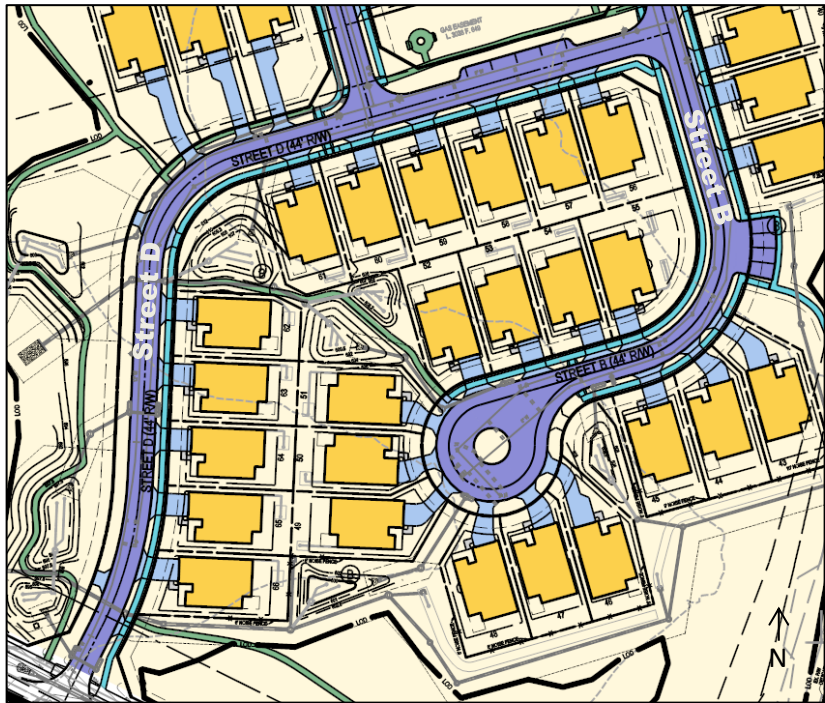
Cul-de-sac bulb at Street B and sidewalks shown in blue. Street D with sidewalk on one side only.
